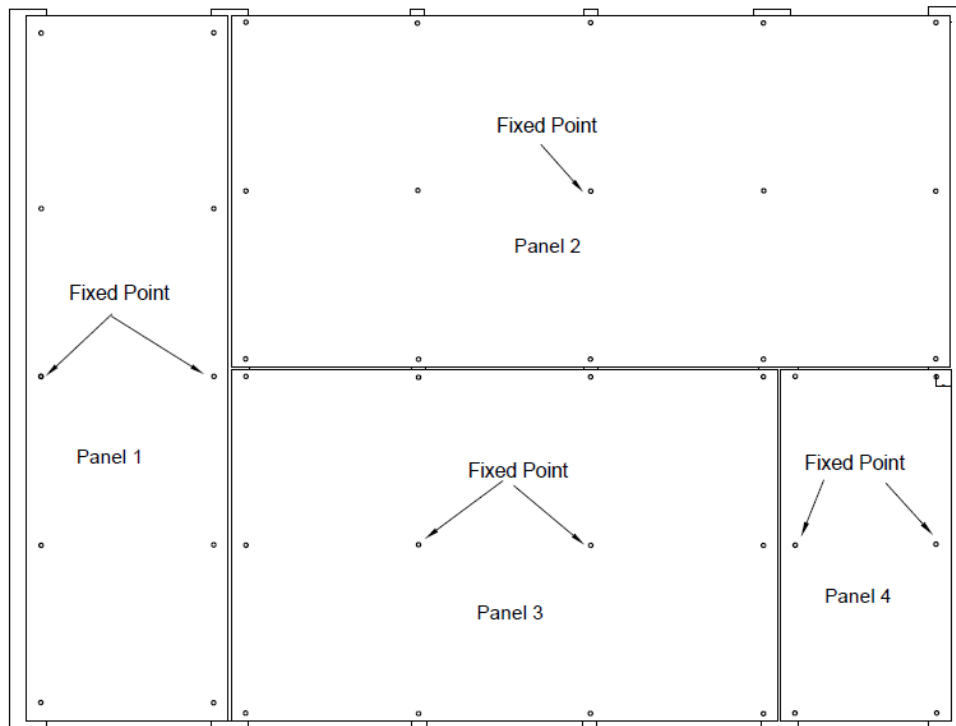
Example of cladding with Ceramapanel® A1 fibre-cement panels. In some cases, the geometry of the panel and the facade layout may require two fixed points.
